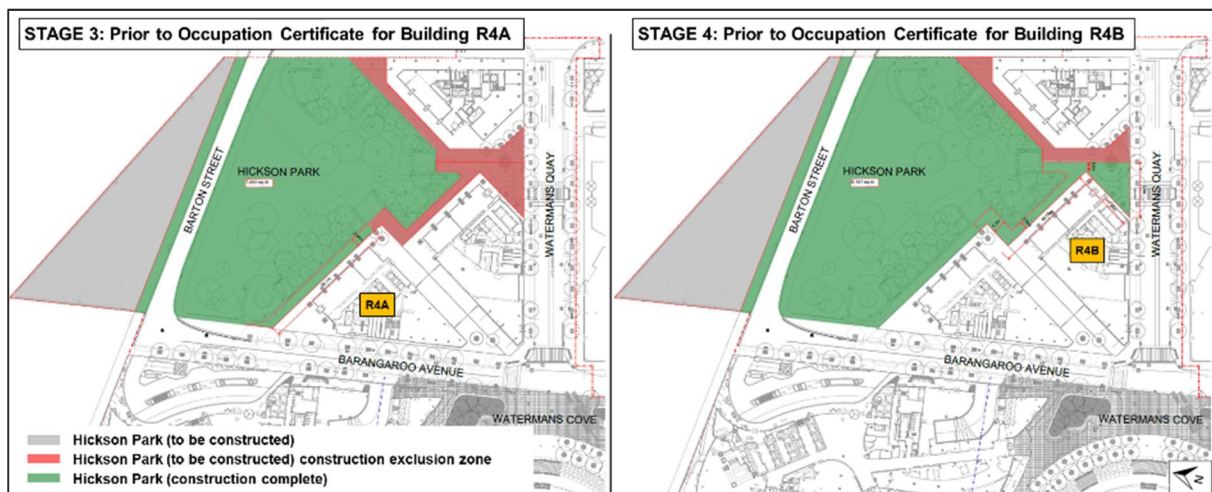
| Proposed Hickson Park construction Stages 3 and 4 (Base source: Proponent's EA)
